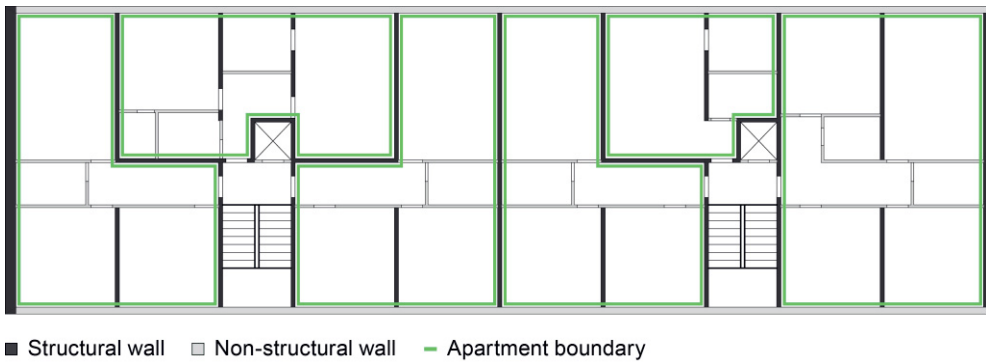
Structural layout and apartment boundaries in two adjacent stairwells of a typical slab block.
